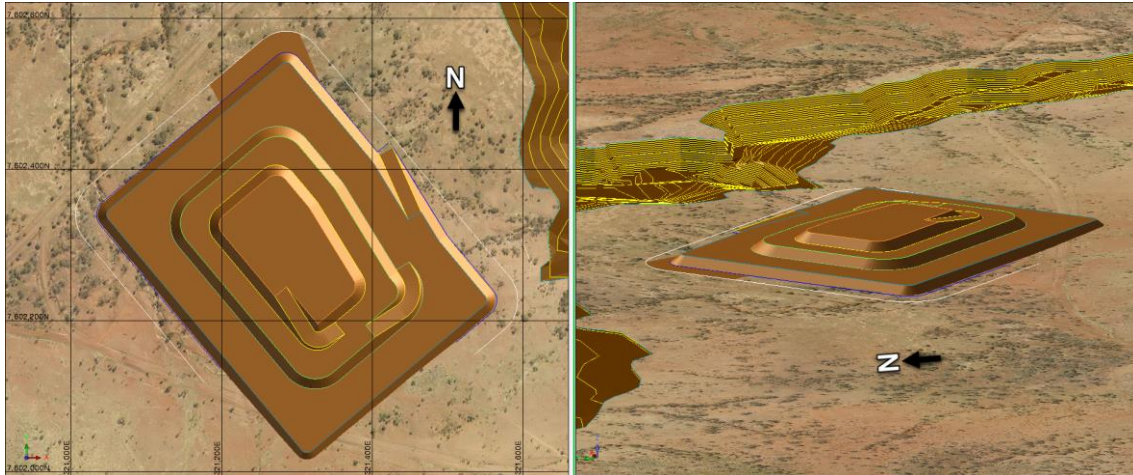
Plan and oblique views of the Northern Zone waste rock storage facility.
